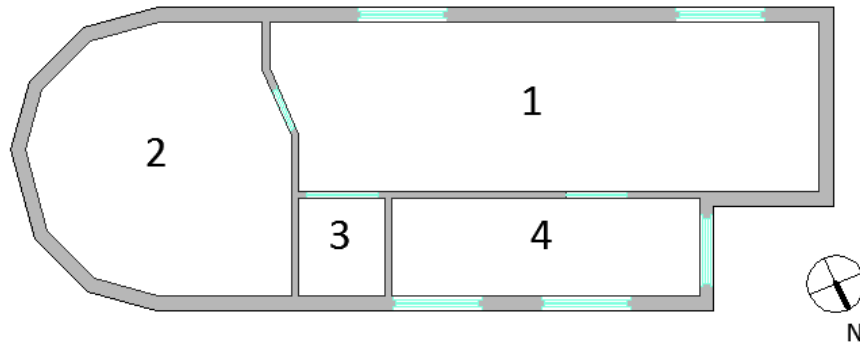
Floor plan. 1: object room, 2: tower, 3: electric compartment, 4: staircase.
